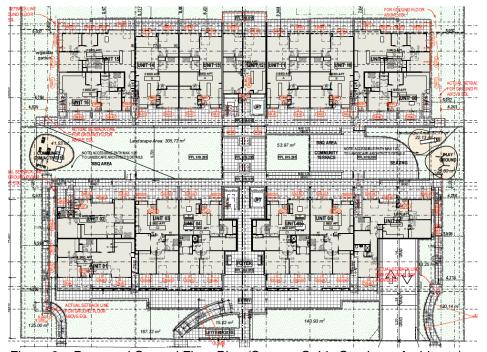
Proposed Ground Floor Plan (Source: Coble Stephens Architects)
